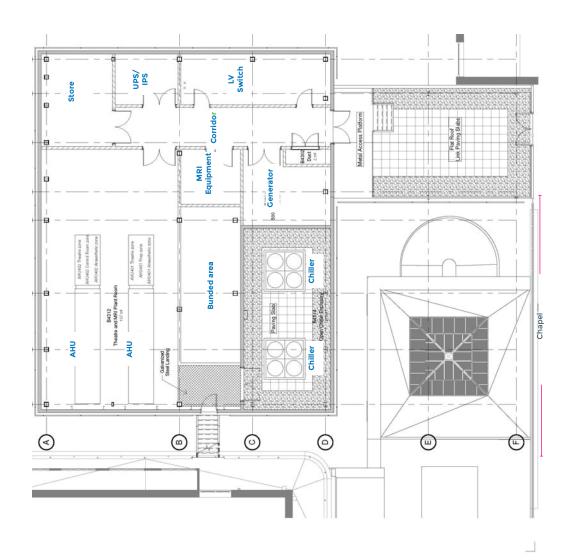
Proposed floor plan at Level 4 (Second Floor)
